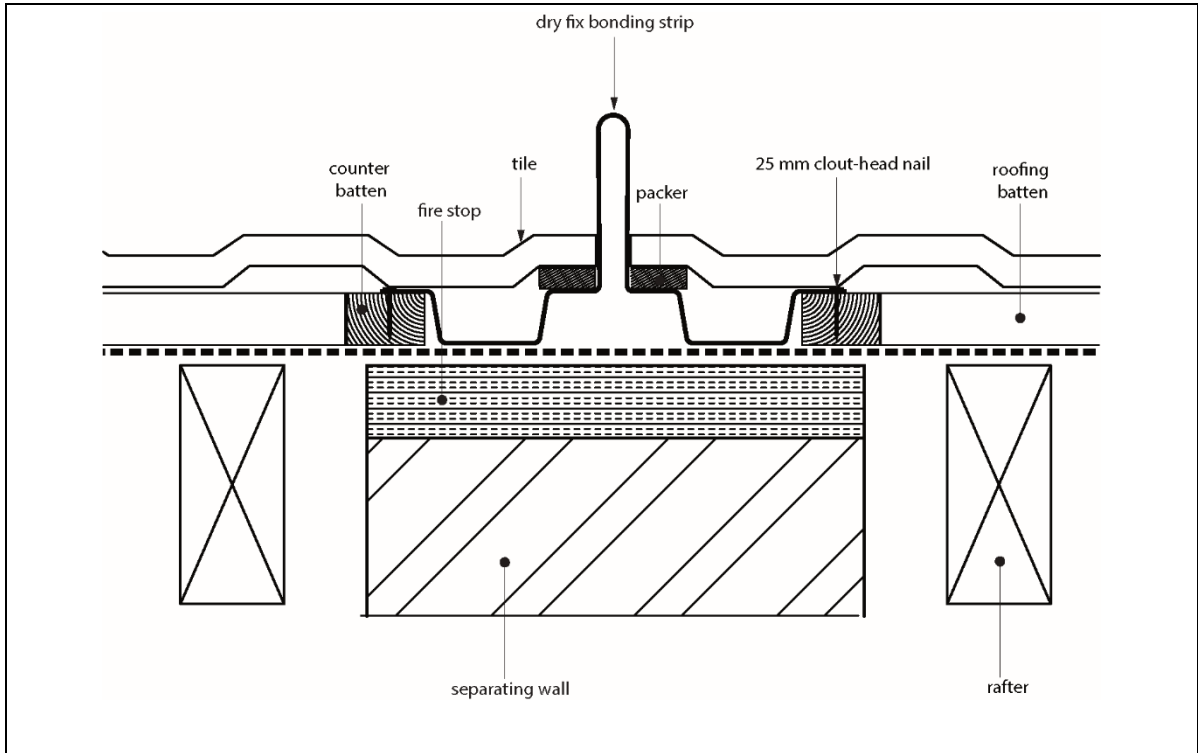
Filon GRP Dry Fix Bonding Strip – GDFBSUB 70 (for adjoining tile/slate roof applications)
